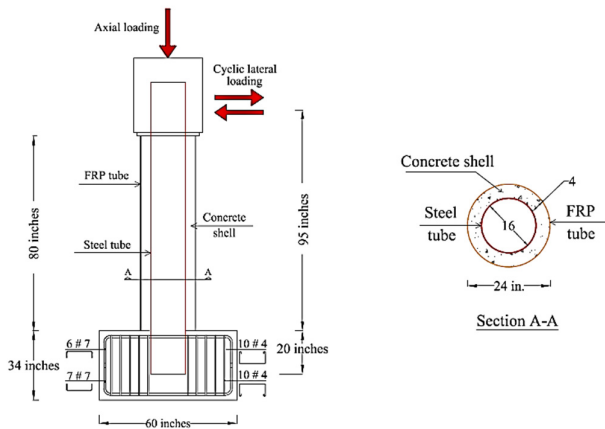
Construction layout of the column (a) elevation, (b) column cross-section (A-A)
